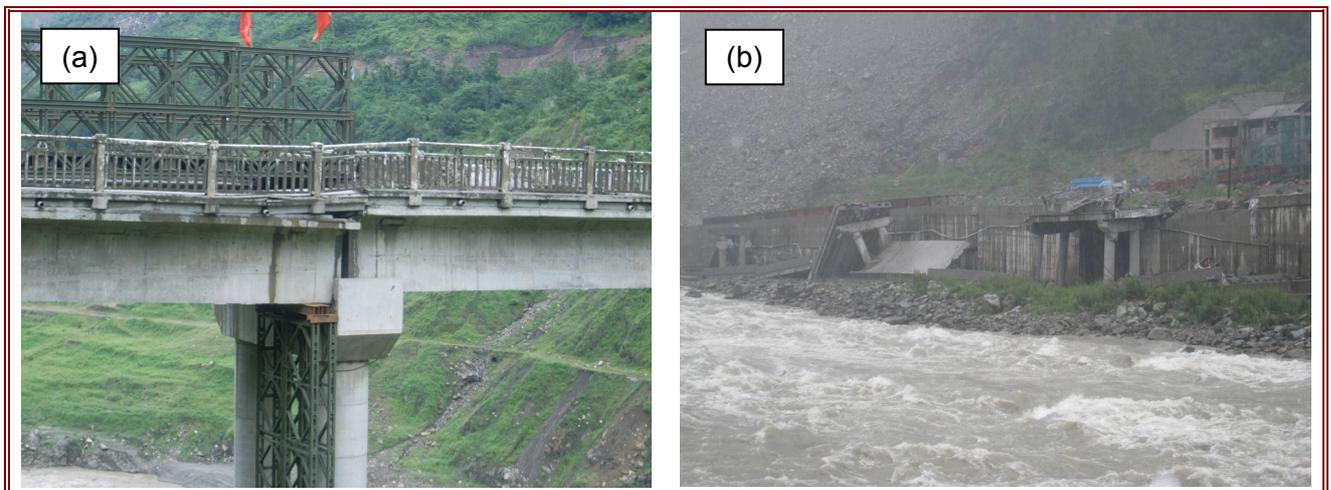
Damaged bridges (a) Longitudinal displacement of simply supported beam at Shoujiang Bridge (b) Collapsed bridge viaducts along Mingjiang River in Ying Xiu Town.
